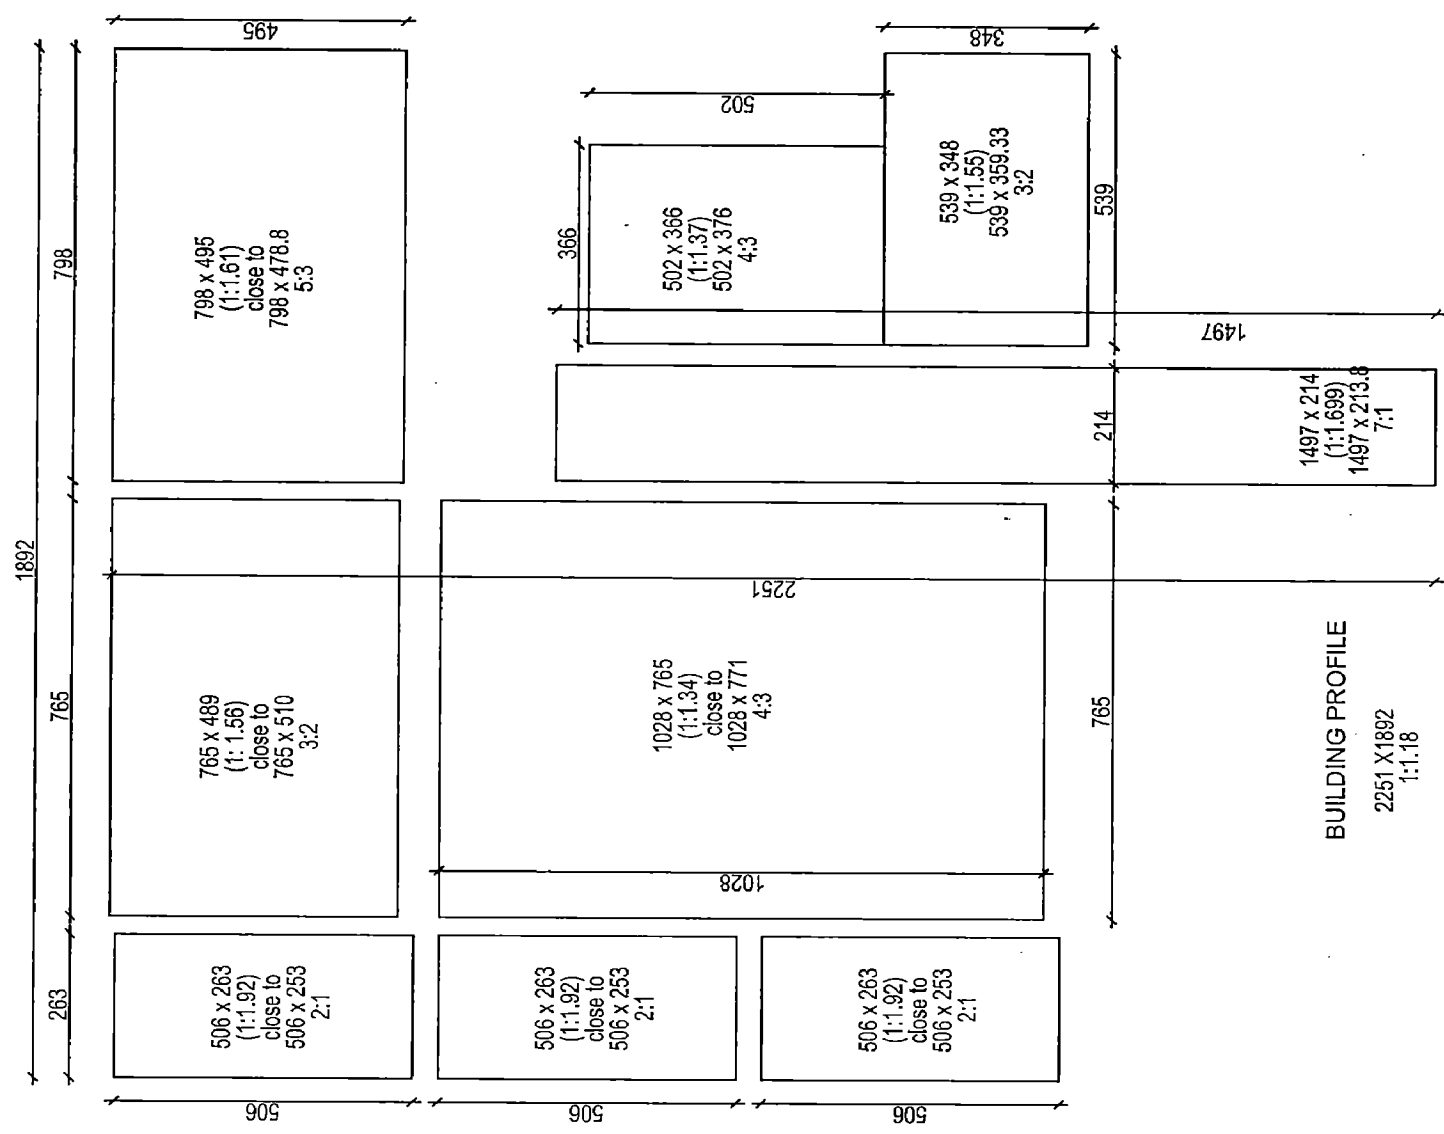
Shodhan Villa, Schematic Analysis Of Ground Floor Plan
